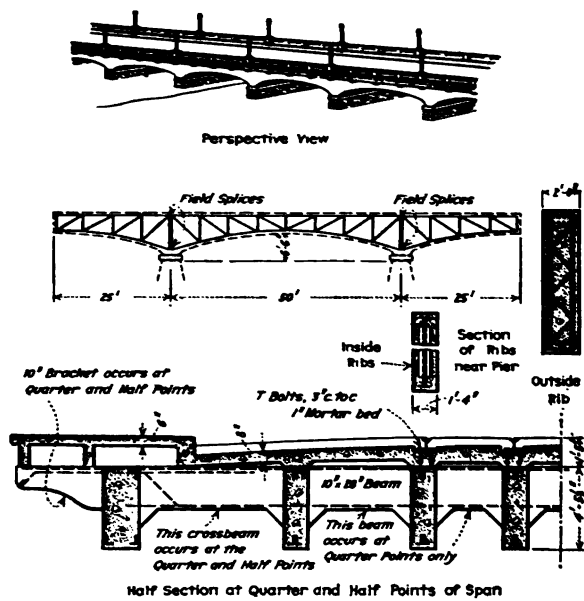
Details of Washington Street bridge, Norwalk, Conn.
